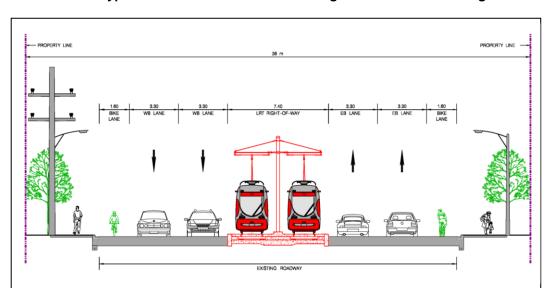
Typical Mid-Block Cross Section - Eglinton Avenue and Kingston Road (36.0 m)
